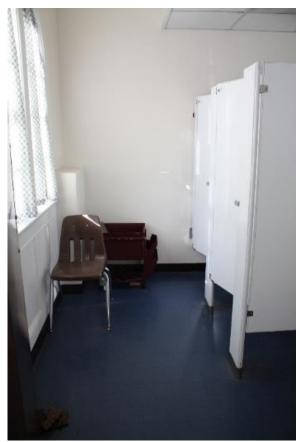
, Historic Courthouse, First Floor, Room 116, general view looking west.
